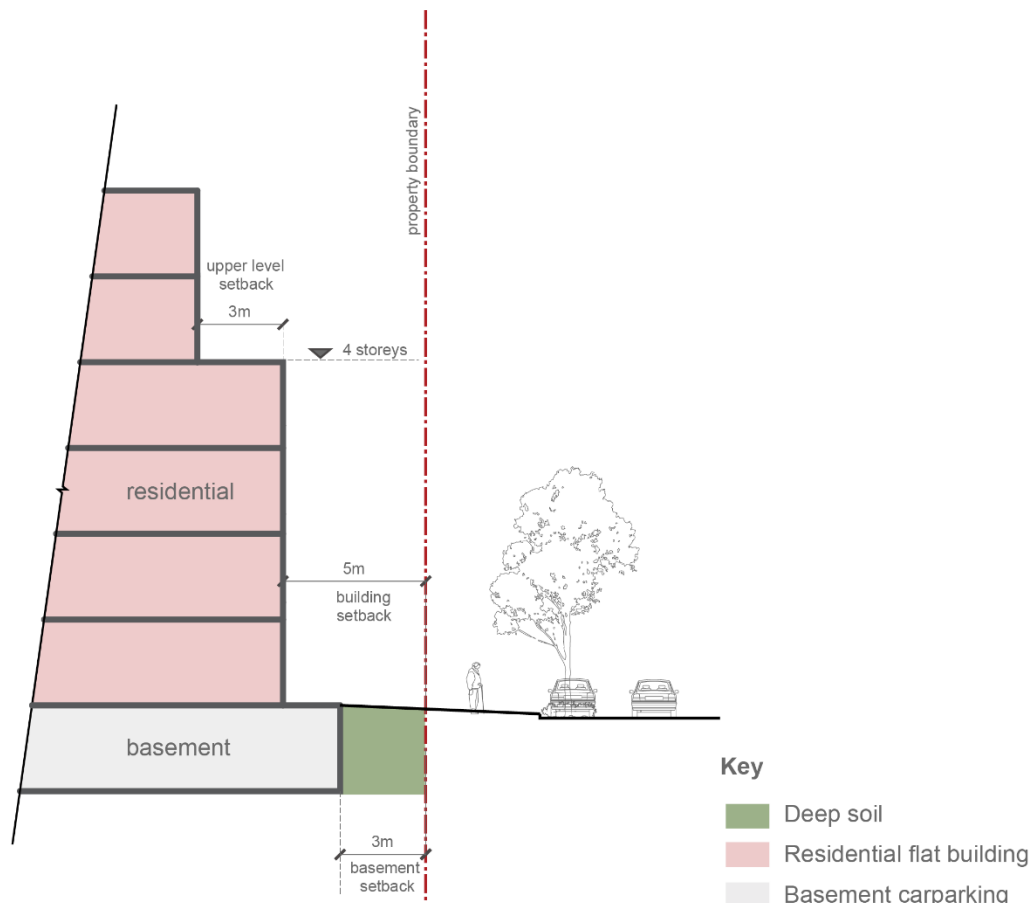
Application of the setbacks required for the residential flat building and basement – Street
